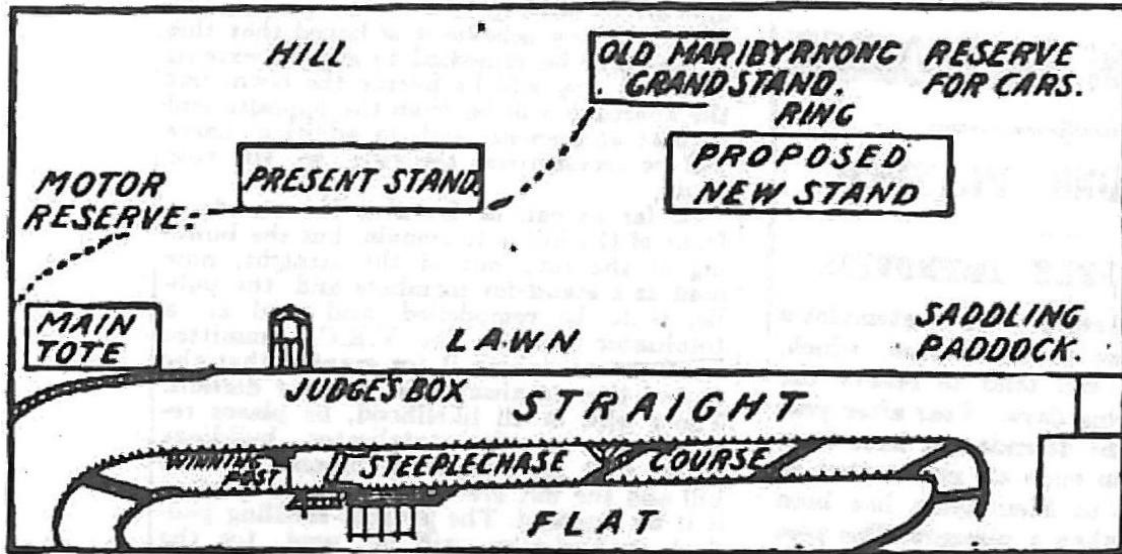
Plan showing proposed alterations to the Flemington Racecourse.
